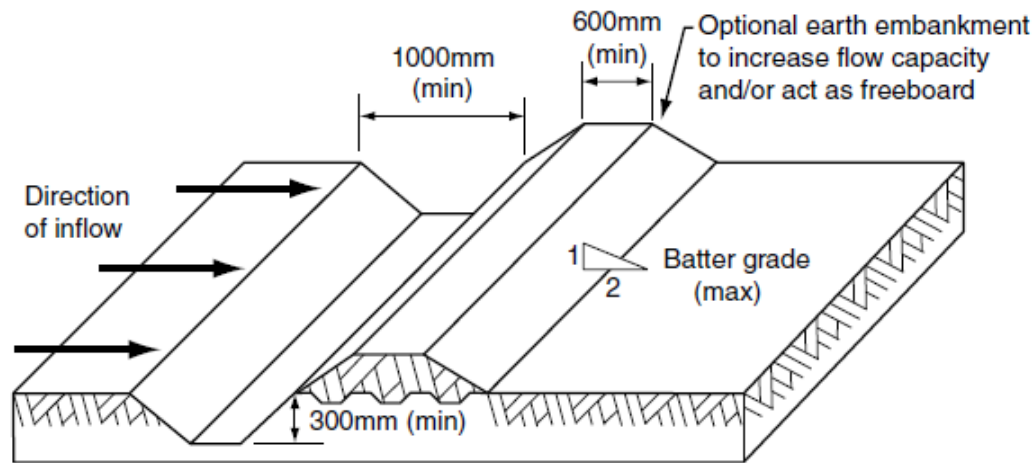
Typical drainage configuration – channel (IECA, 2008)
